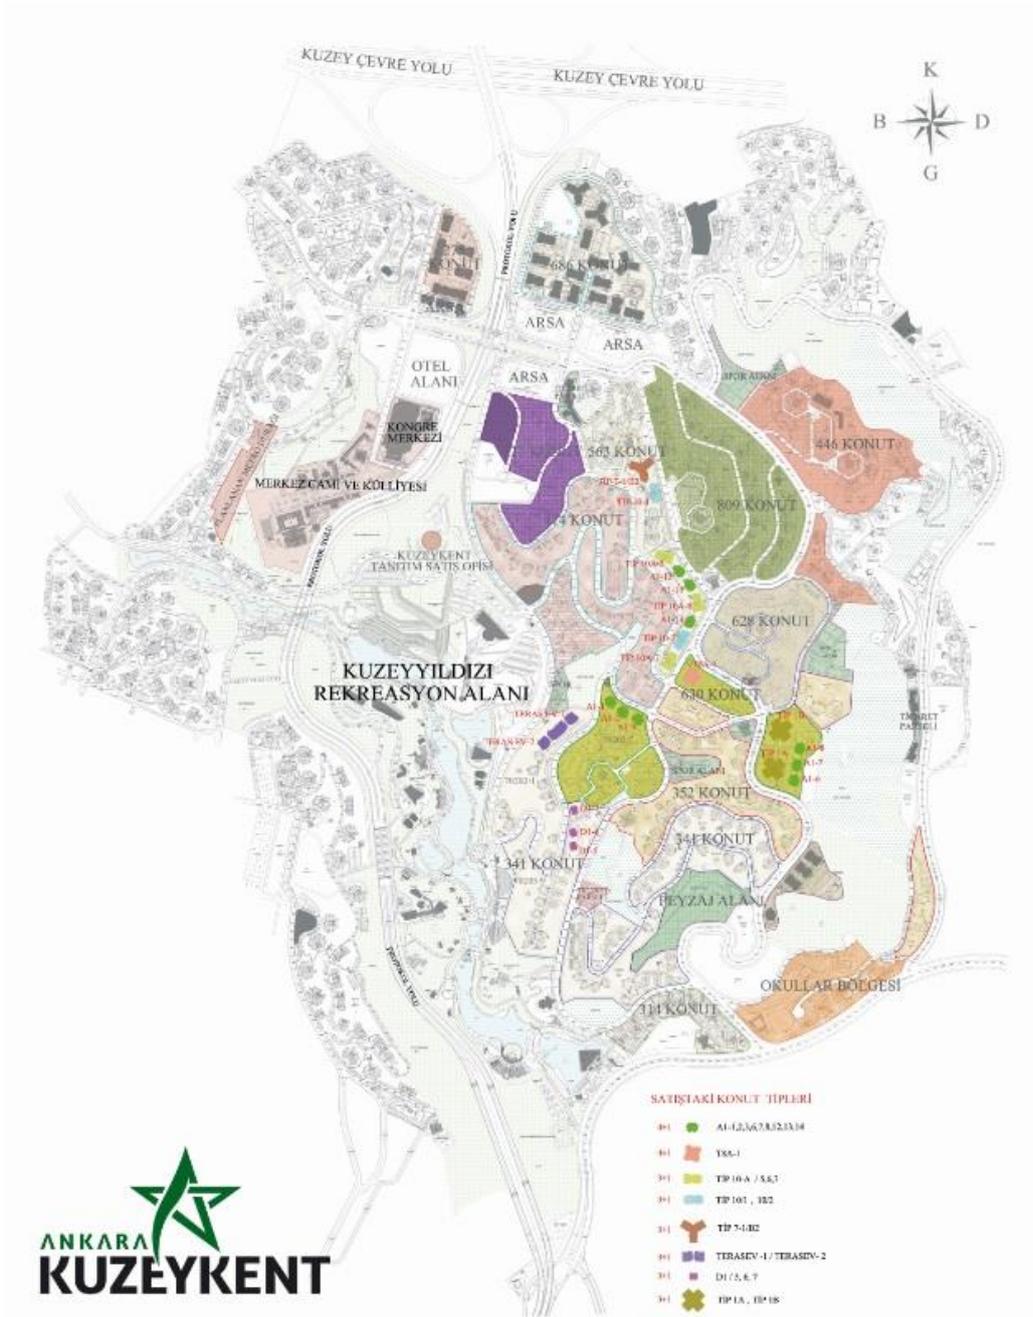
Figure IV.III.IV. : General Layout Plan of the Project (Source: TOBAŞ)
